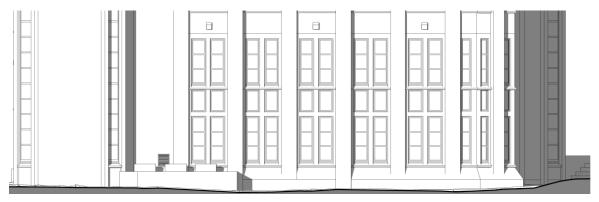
Existing north-east elevation Sir Cyril Taylor Library, at ground floor level.
